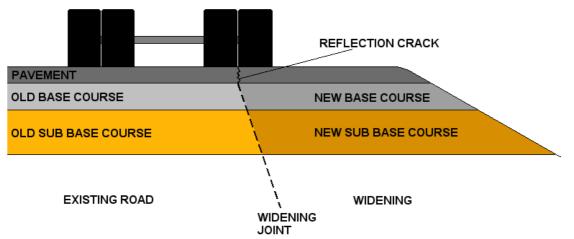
A reflection crack is likely to take place if the construction joint is located under the wheel path
